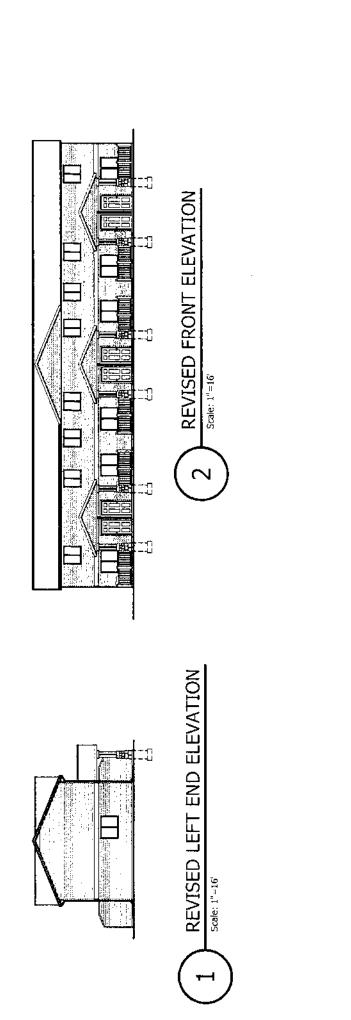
EXHIBIT E - REVISED ELEVATIONS 10-PLEX
